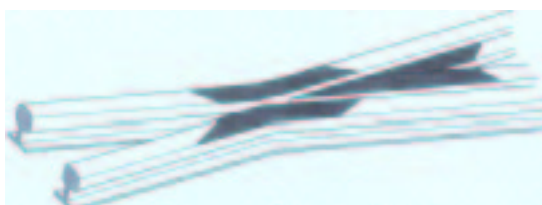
Black area of crossing exposed to wear. Damaged parts are deformed and often cracked.
